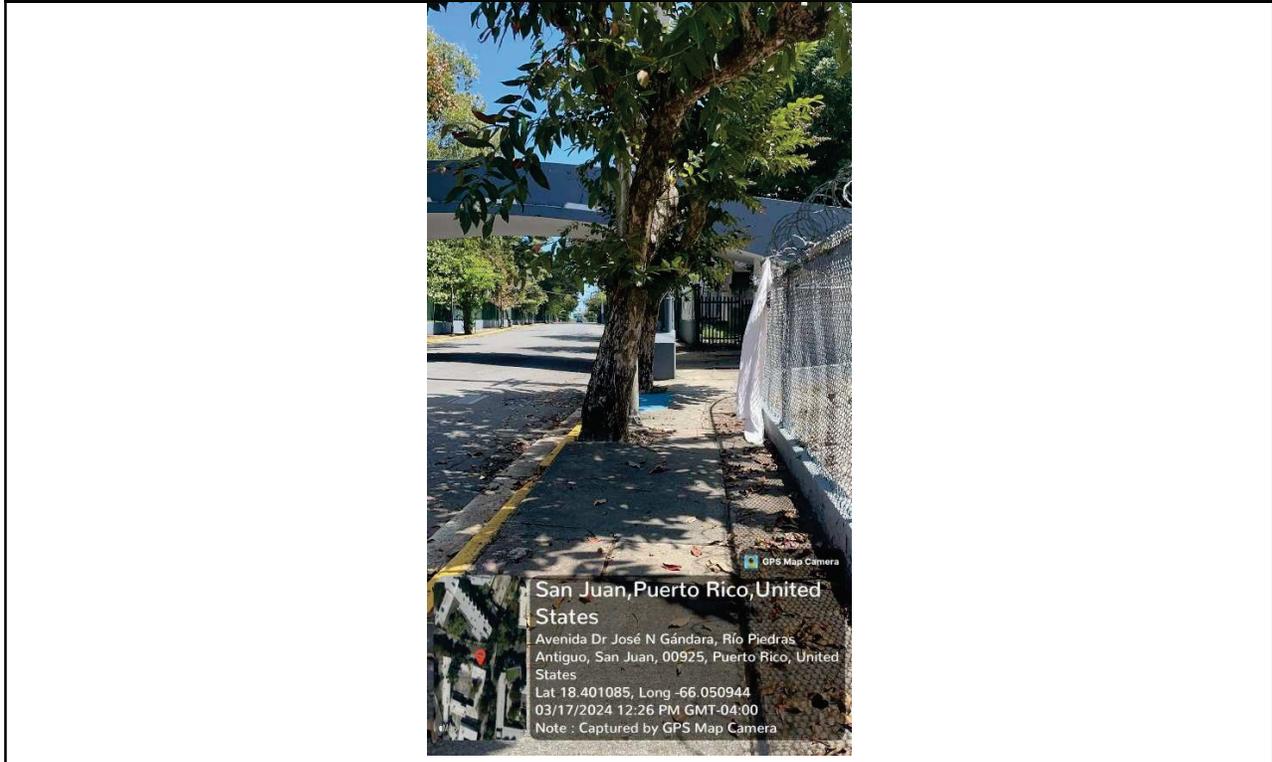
Details of sidewalks connecting east side of the bridge, looking west from José N. Gándara Avenue.
